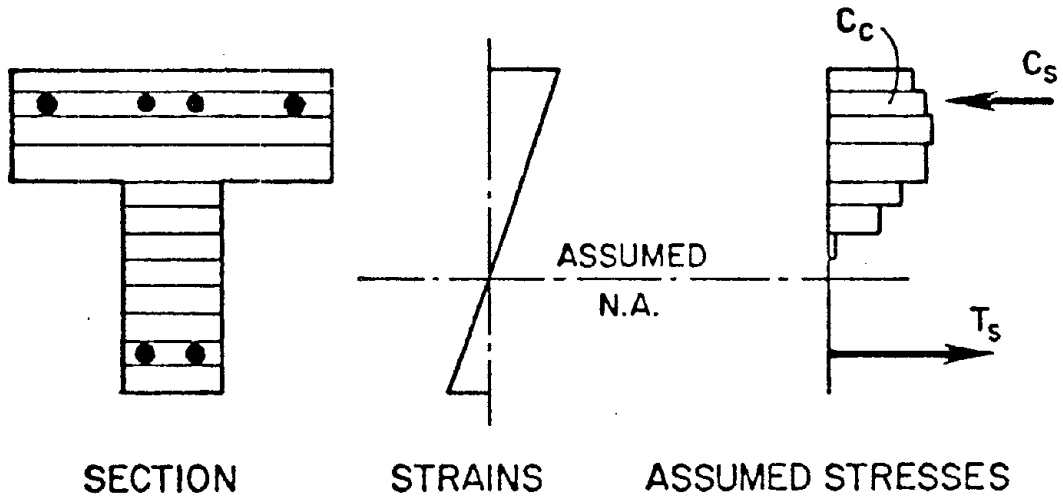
CROSS SECTION OF LAYERED MODEL
